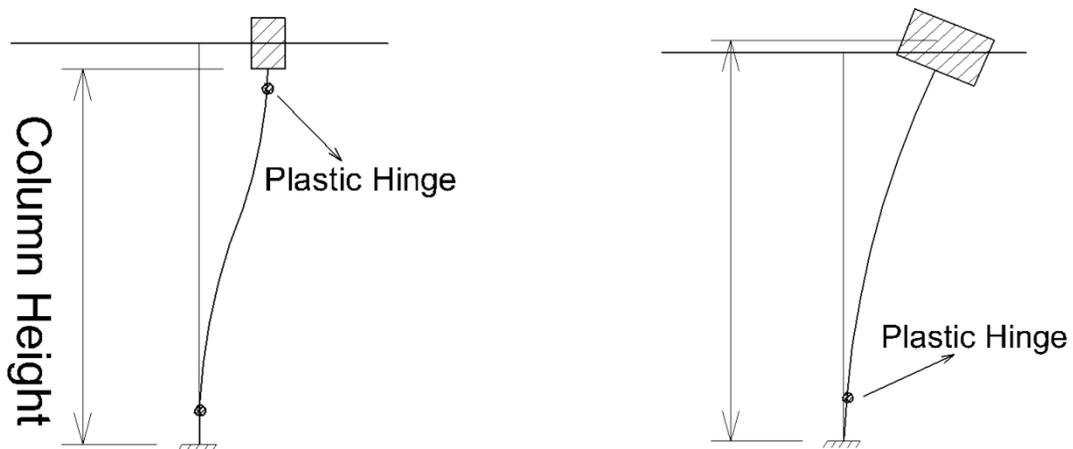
Deflected shape of a three span bridge under longitudinal (along traffic) direction
